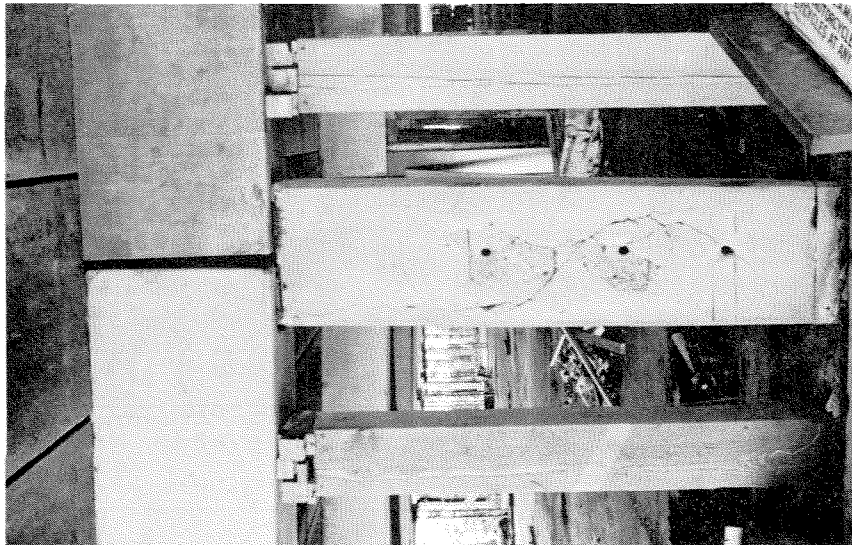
151 Cracked column and displaced beams in the parking structure adjacent to the Union Bank, Sherman Oaks.
